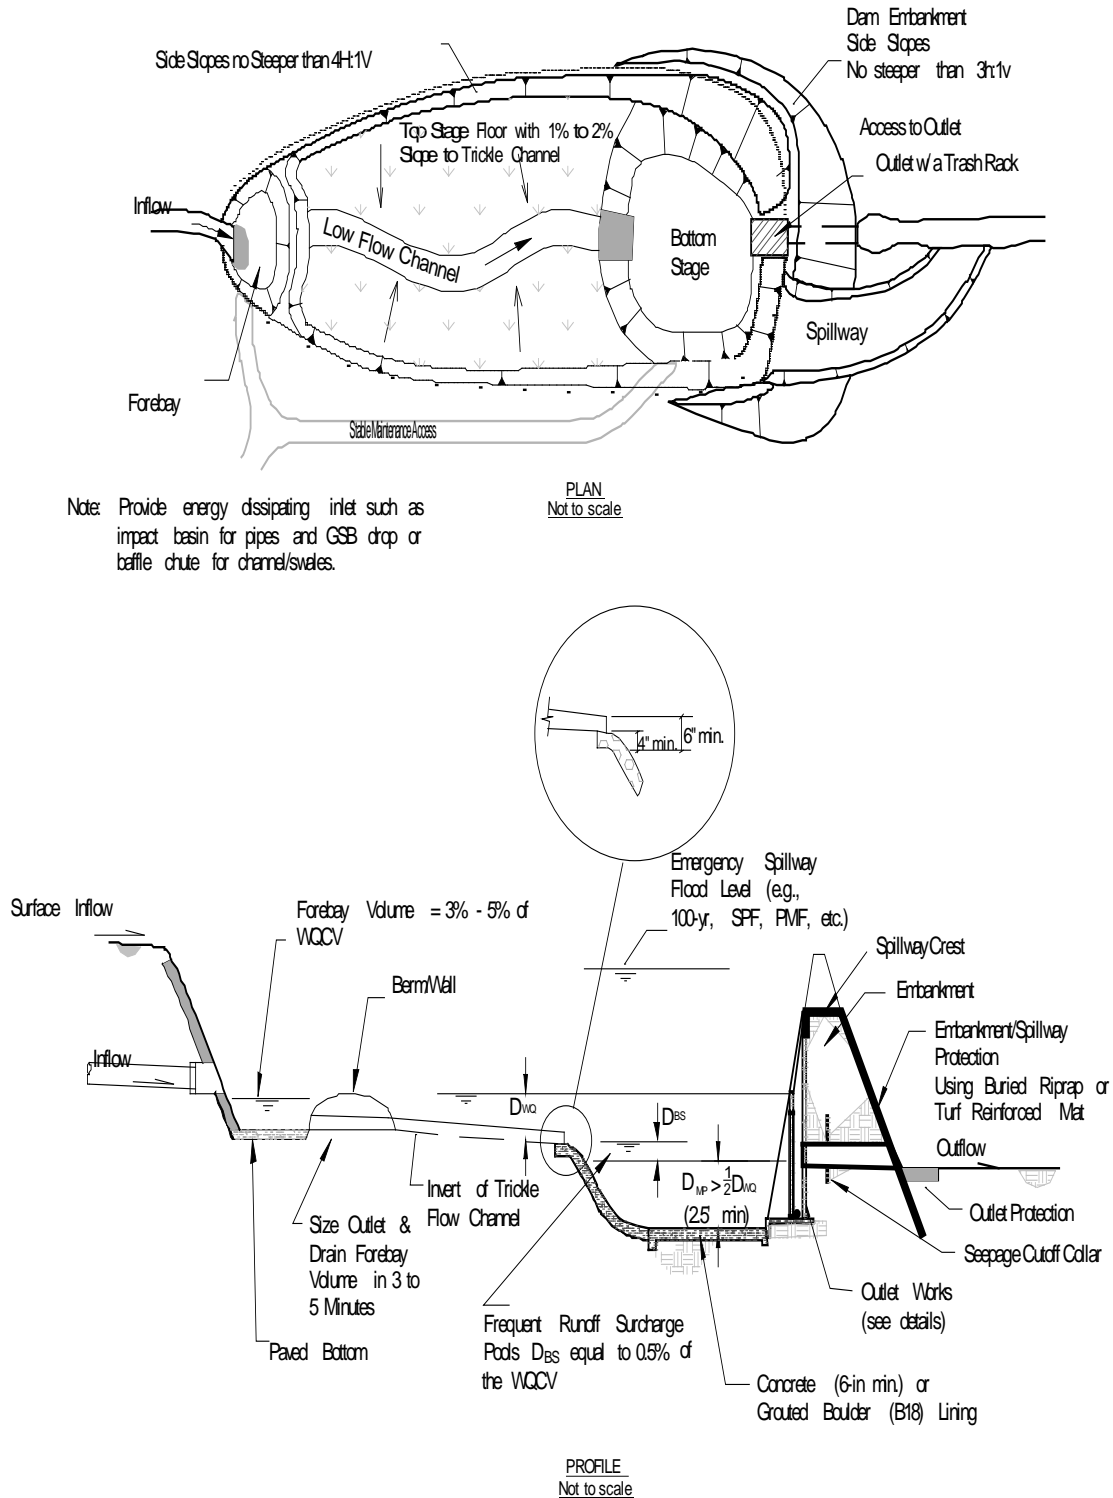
Extended Detention Basin Typical Plan and Profile
